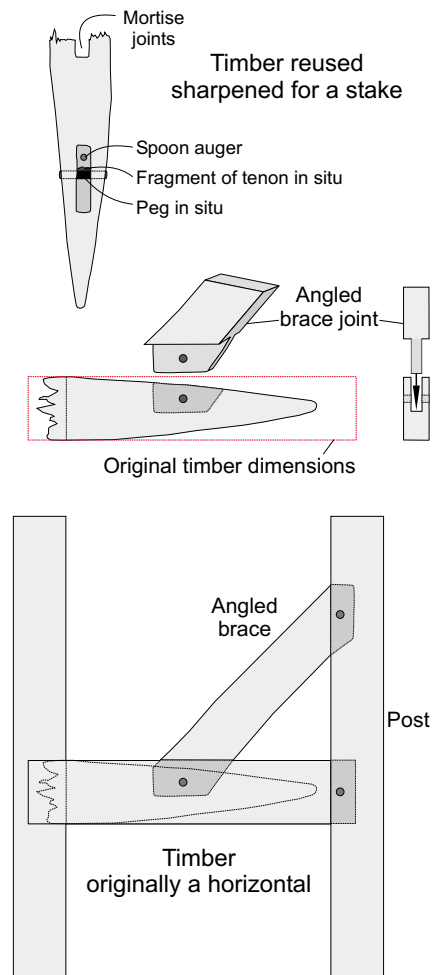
(Top) Building timber reused in revetment. One end has been sharpened to form a stake, but a mortise hole with peg in situ survives. (Bottom) Suggested original position of timber in frame of building.
